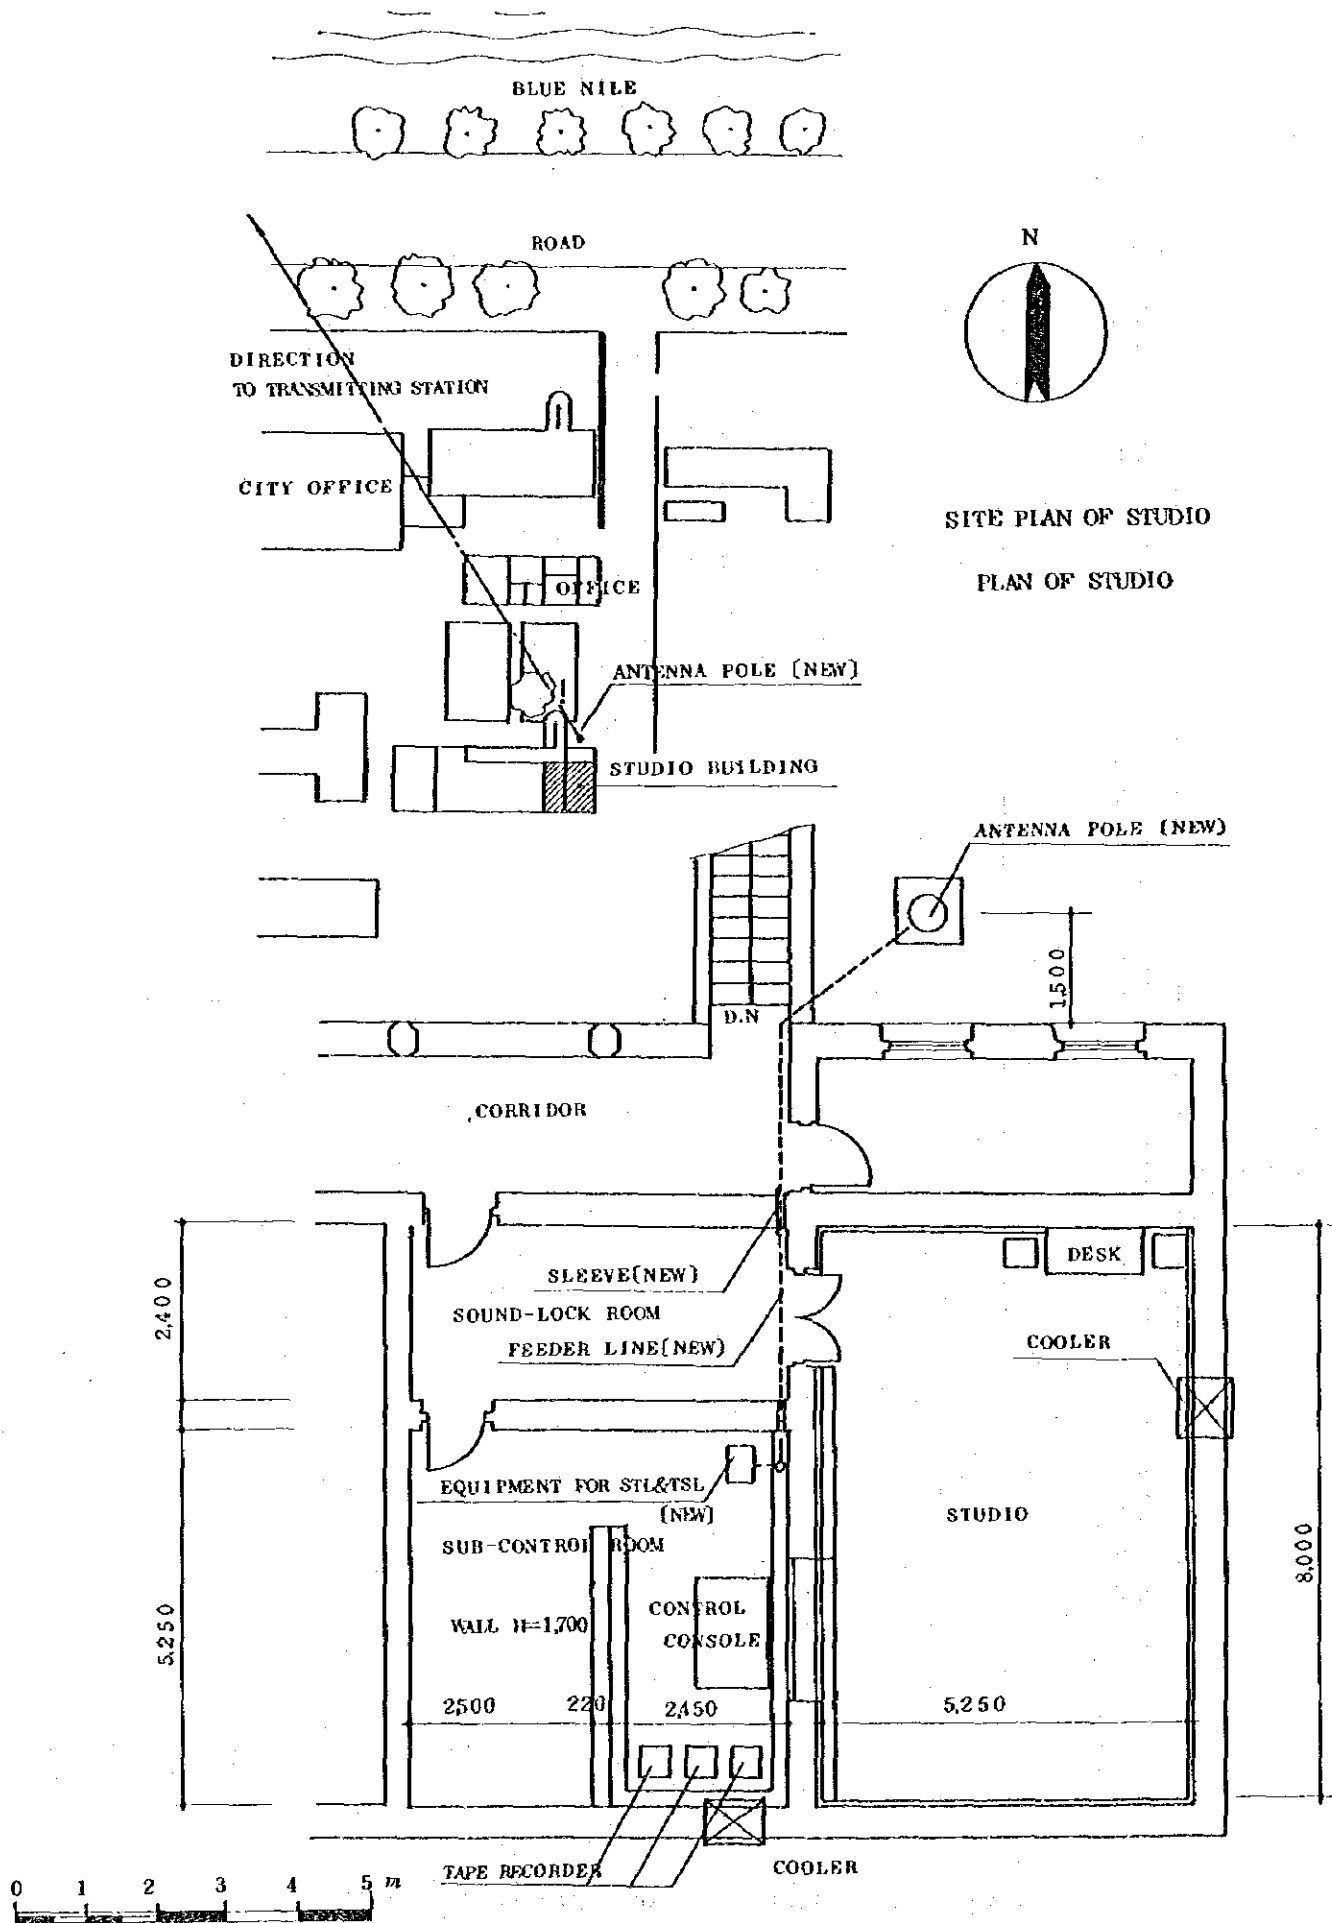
Layout of the Equipment and Other Facilities (Wad Medani)
